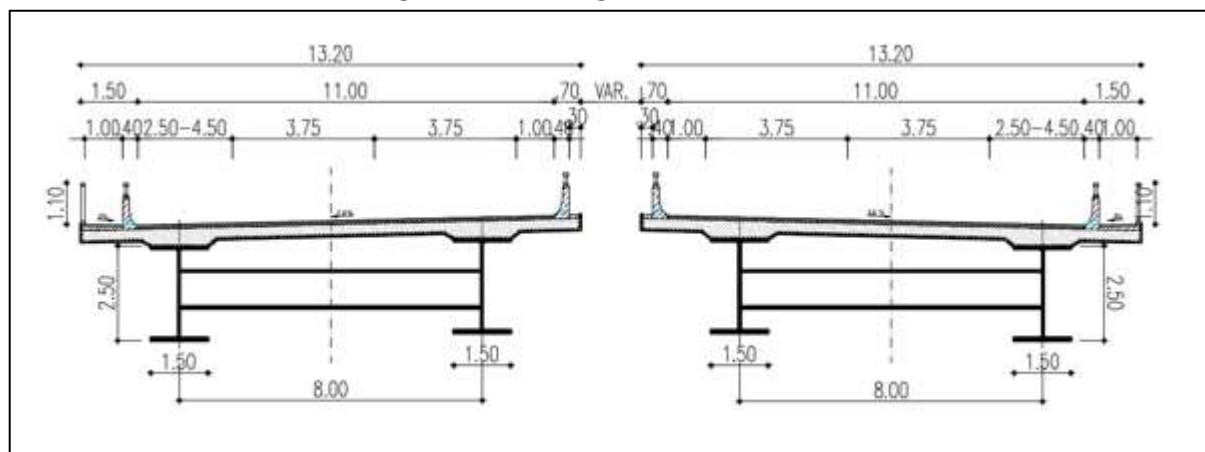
For pre-stressed precast PSC beams bridges – type 2
